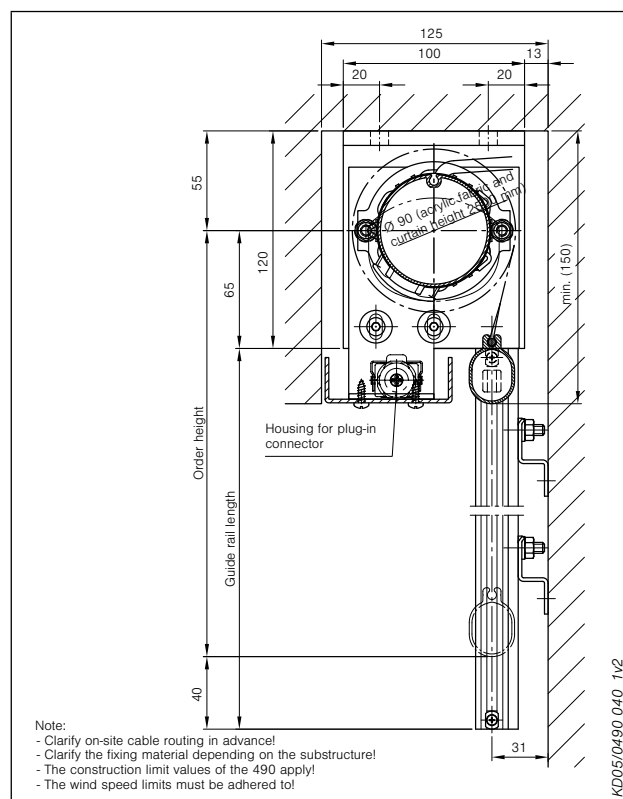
Vertical awning 491 with motor, left rolling blind with guide rails, ceiling installation with inspection cover
